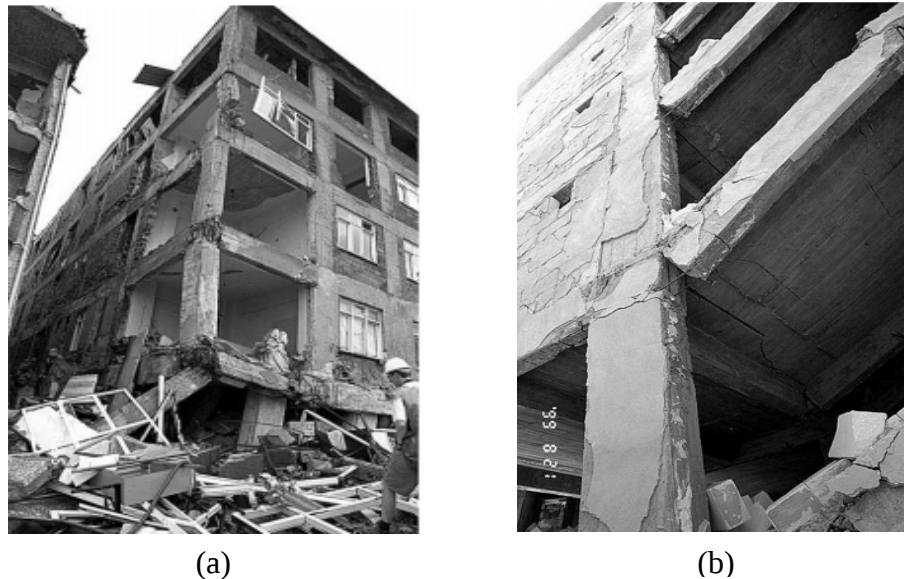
Structural failures found in 1999 Turkey earthquake. (a) Joint failure due to insufficient reinforcement (b) Strong beam – weak column failure (Sezen, Whittaker et al. 2003)
